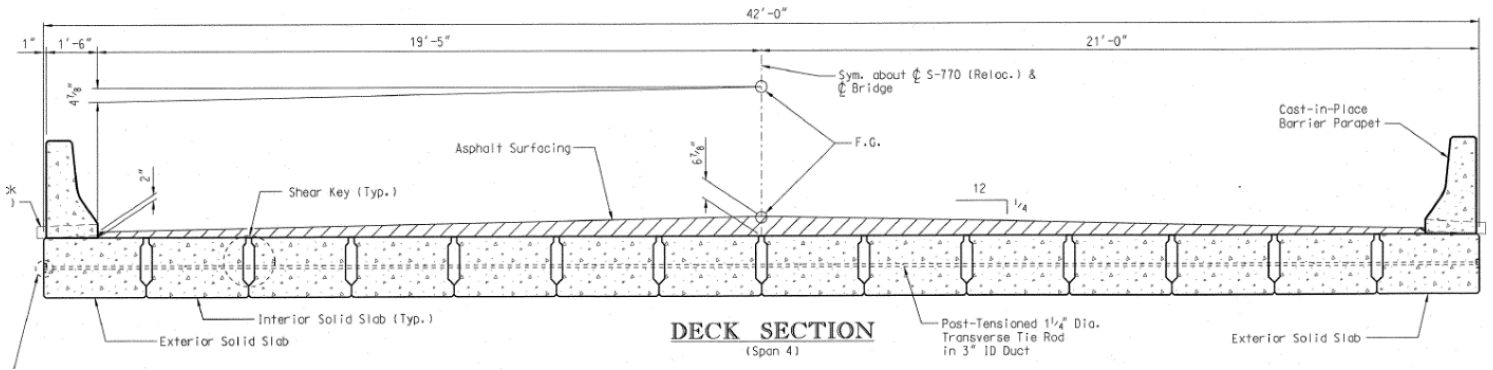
Solid Slab Cross-Section from Hanging Rock Bridge
